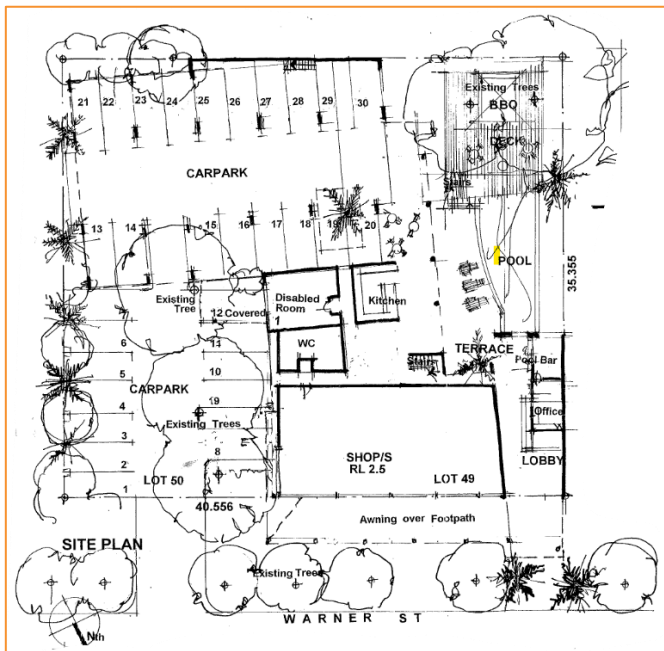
Extract of Existing Approved Ground Floor Source: Appeal No. 1 of 2001
